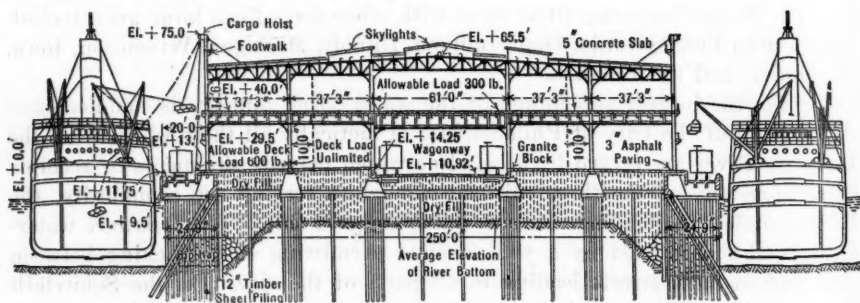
SECTIONAL ELEVATION, MCKEAN STREET PIER, PHILADELPHIA, PA.
